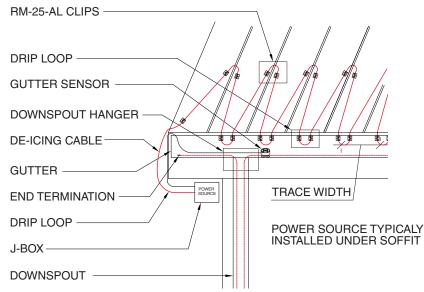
De-icing cable on sloped standing seam metal eave only. This layout typically uses RM-25-AL clips with VHB adhesive pads.
